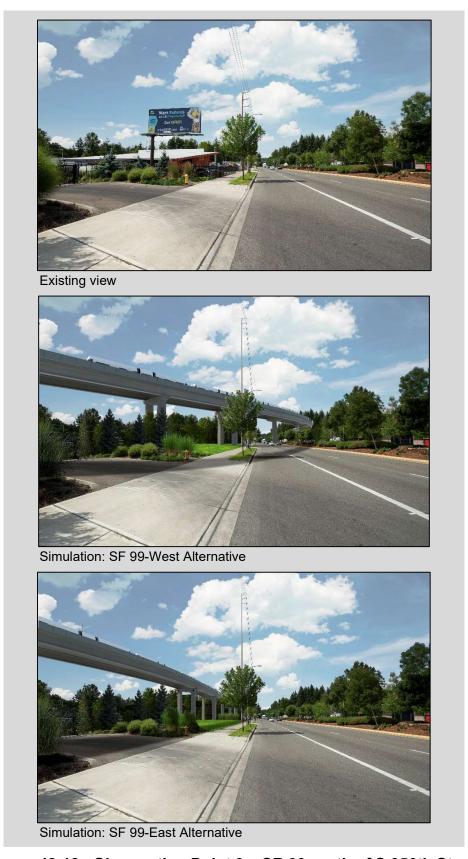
Observation Point 9 – SR 99 north of S 356th Street (looking southwest)
